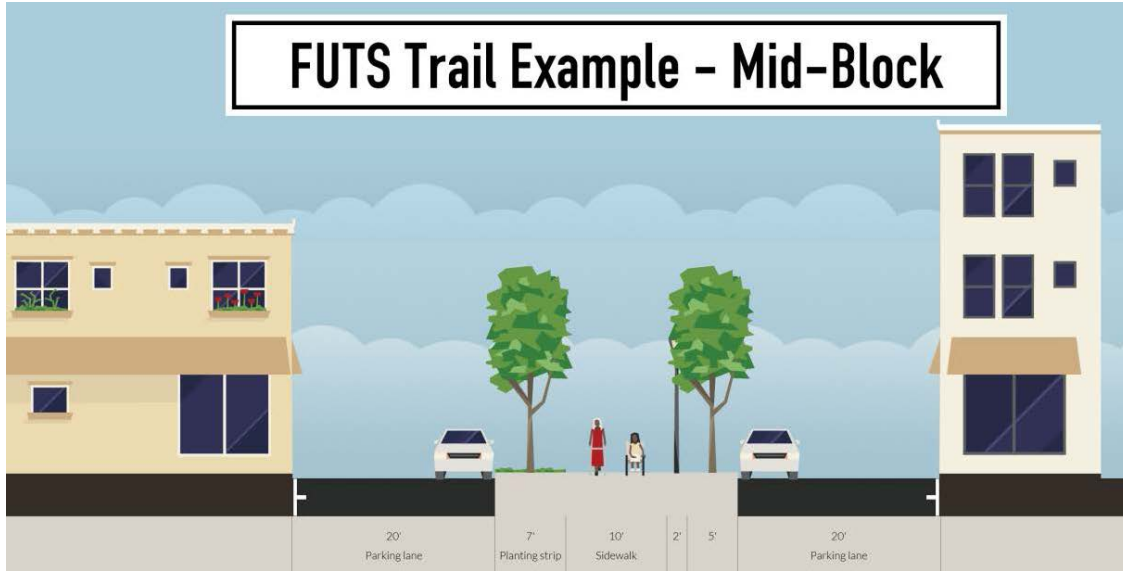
Cross-Section of FUTS Trail through the Neighborhood (24-foot right-of-way)
